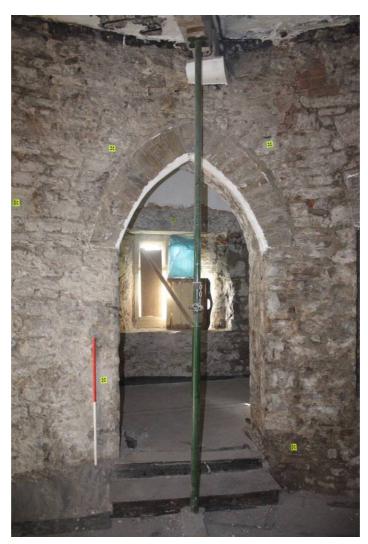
Entrance from first floor of D-Shaped Tower to Lower floor of Square Tower
